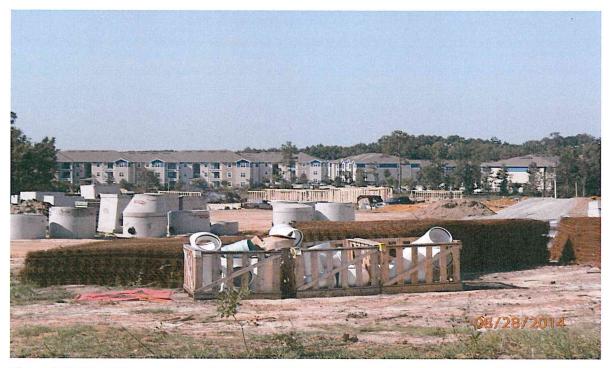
Subject Site currently under construction showing the adjacent property to the south (The Forum).
